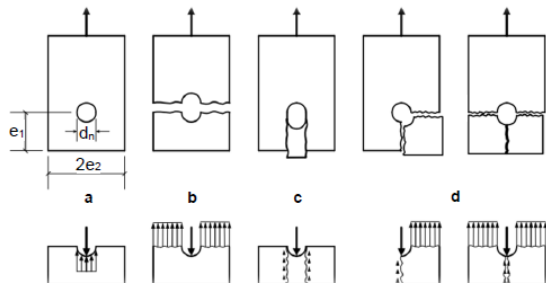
FRP bolted connection failure modes (a – bearing; b – net-tension; c – shear-out; and d – cleavage), adapted from [3].
